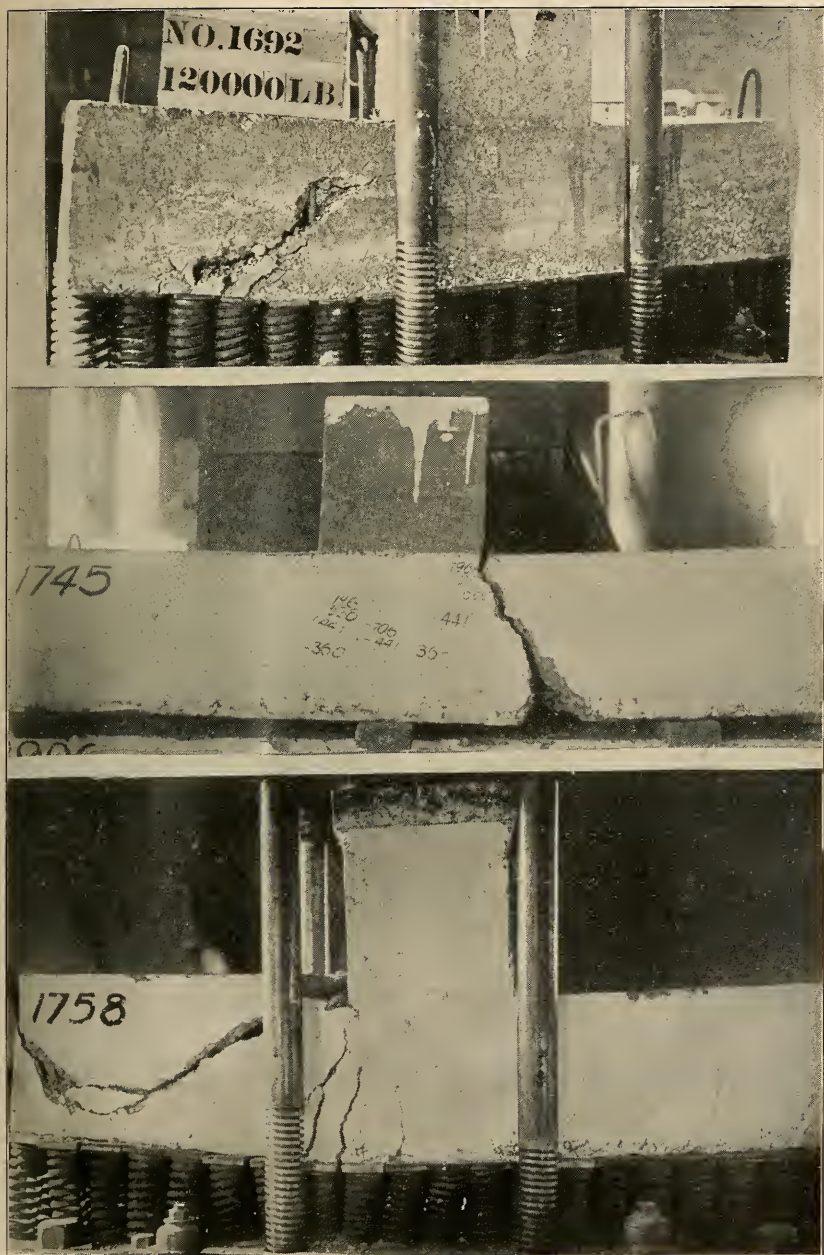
VIEWS OF REINFORCED CONCRETE WALL FOOTINGS AFTER TEST.
